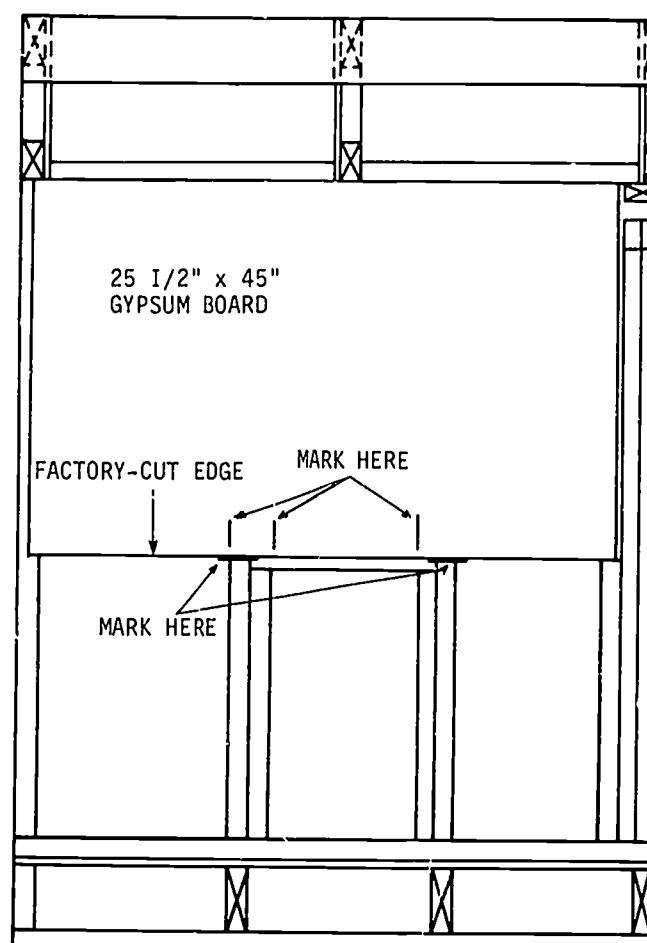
A-4. Interior View Showing 25½" x 45" Gypsum Board in Place, with Factory-Cut Edge at Bottom
